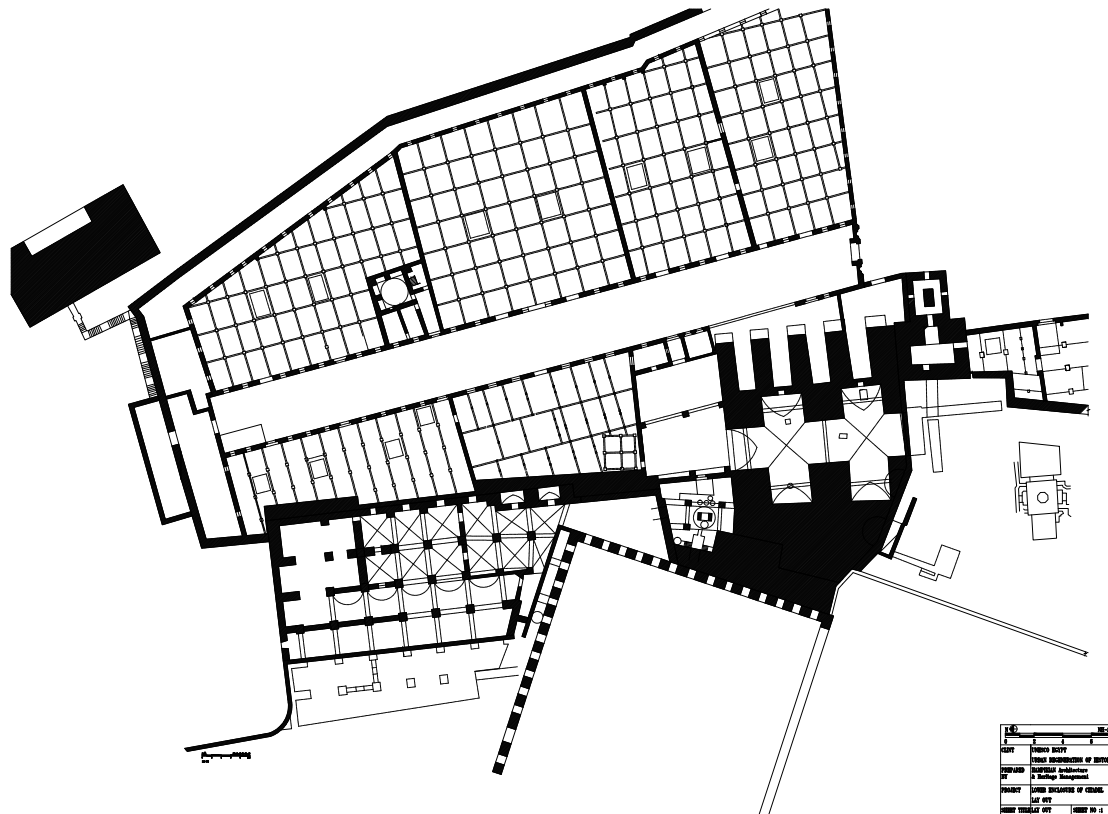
Ground plan showing the double-cross hall and its surrounding structures as an ensemble (1:100)
